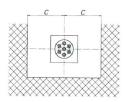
Space requirement for replacement Table of dimensions (mm) (Fig. 14)
